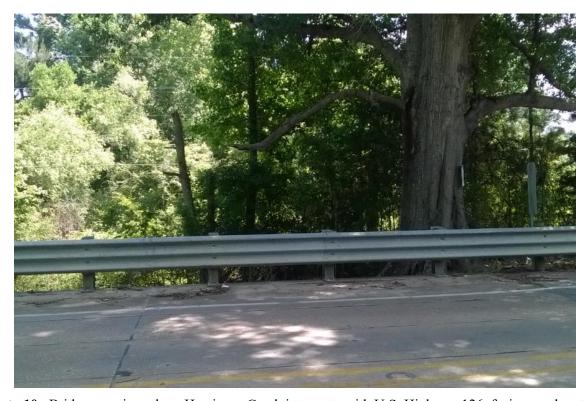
Bridge crossing where Hurricane Creek intersects with U.S. Highway 126, facing northeast.
